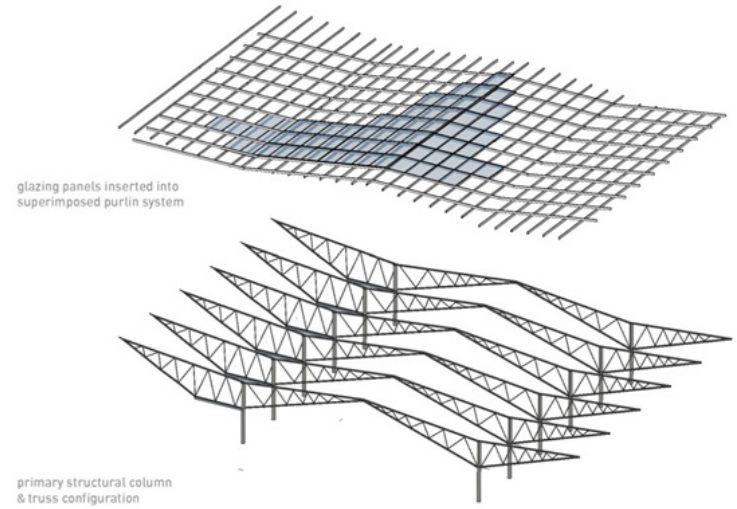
TECTONIC GIRDER TRUSS ROOFING PROPOSAL
